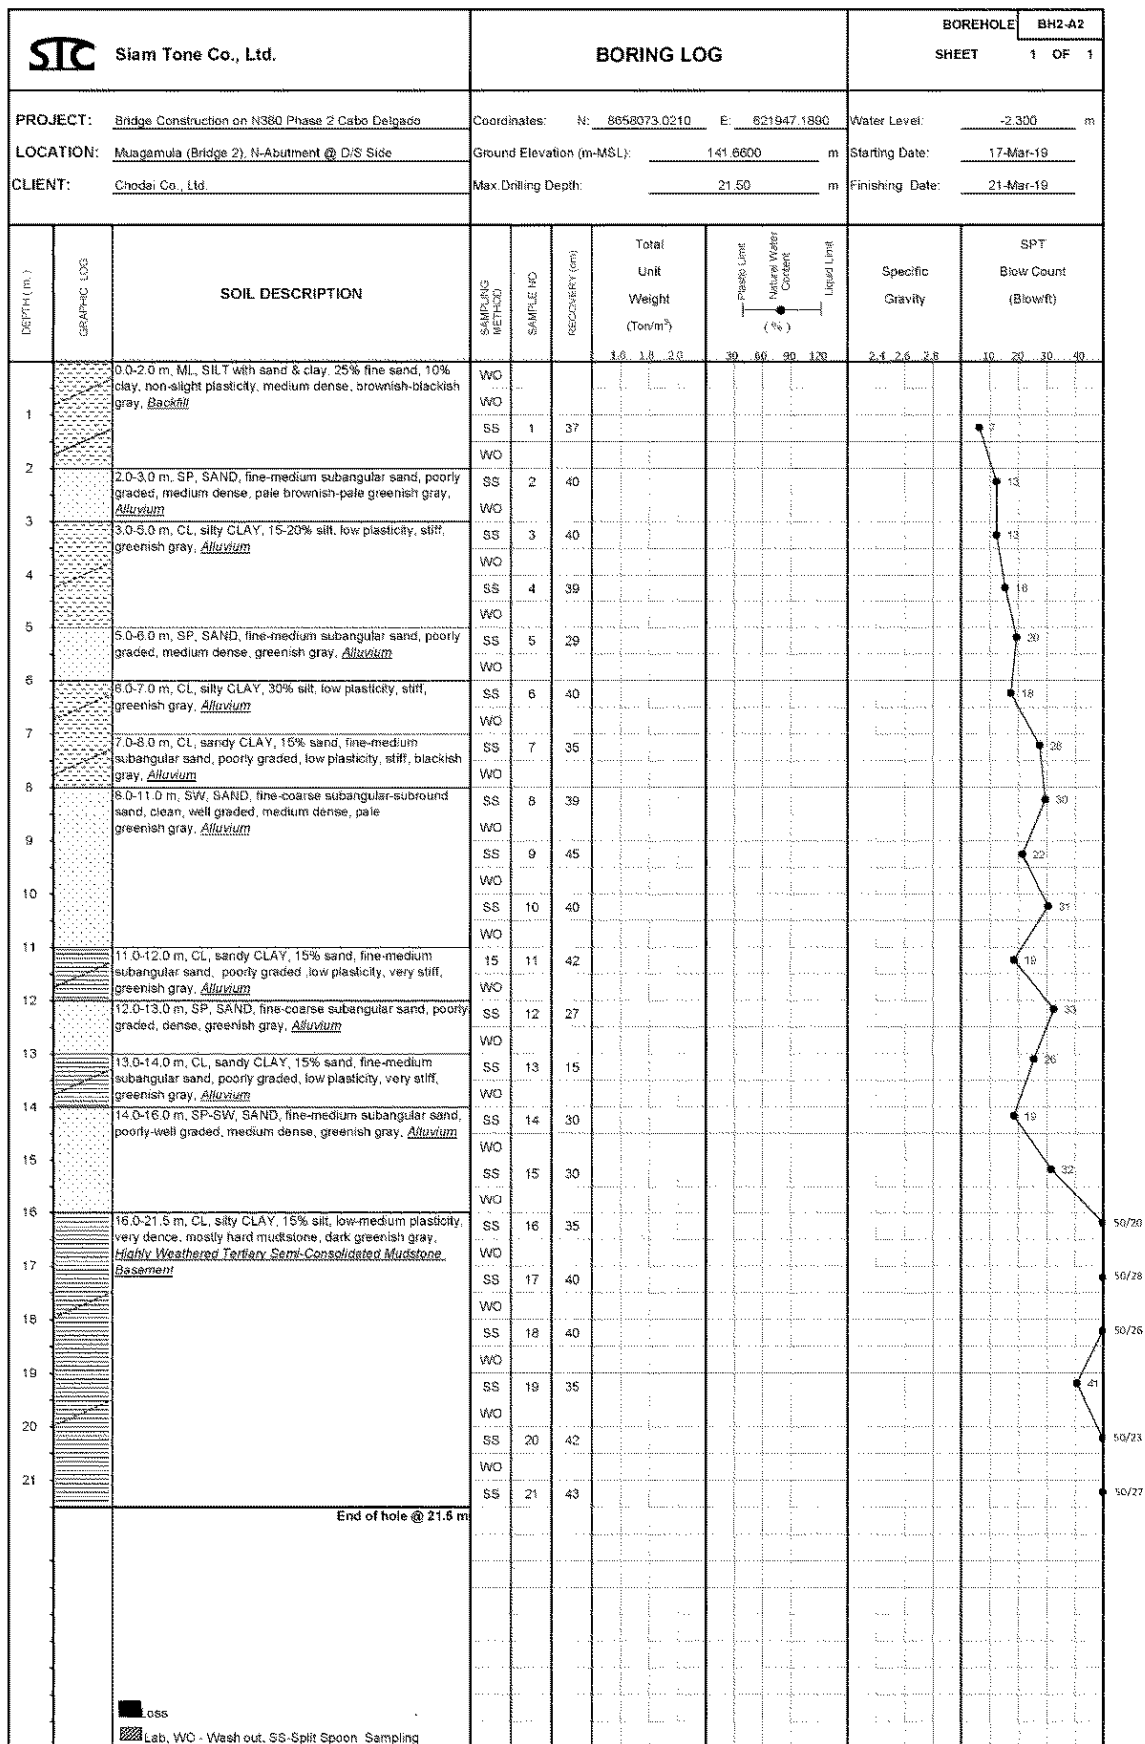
BH2-A2/1 at N-Abutment D/S Side of Muagamula Bridge (B2)
